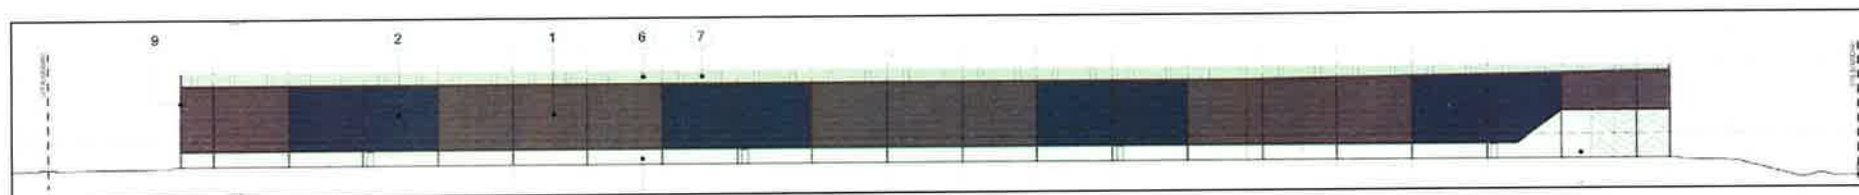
Façade Treatment Example External to Site – Building 5 Southern Elevation to M4 Motorway
